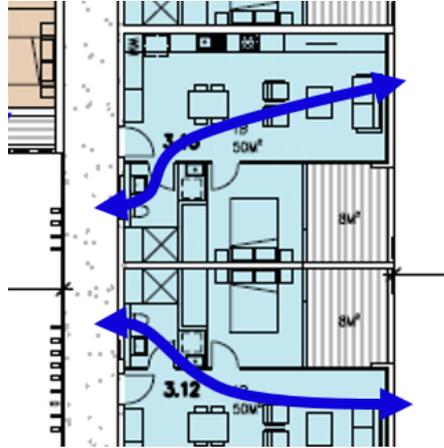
extract from floor plan showing the location of high level operable louvre windows within bathrooms for apartments at the rear of the site. See attachment A for greater detail.
